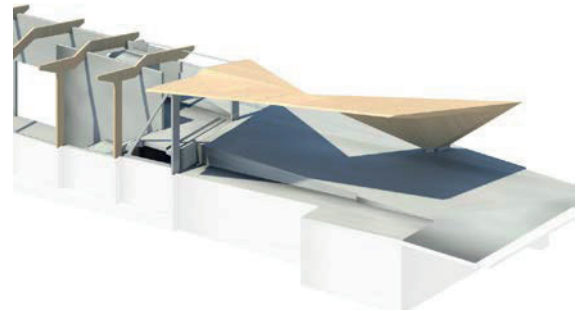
3D view of the pleated structure of the northern roof in solid wood
